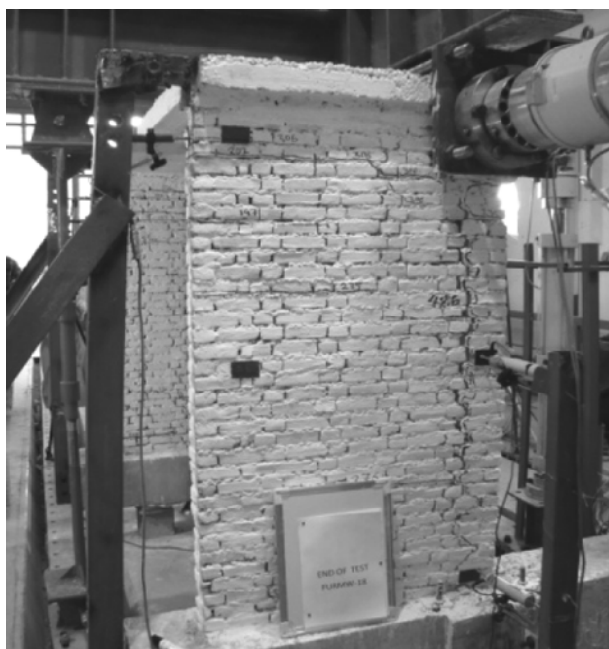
Crack pattern on flange side at drift 0.9% of FUURMW-18 (U-shaped wall).
